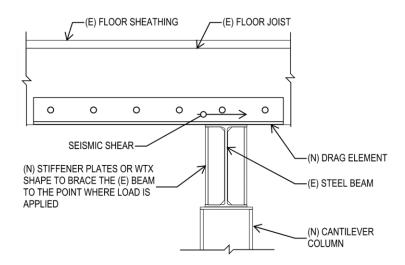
Detail illustrating how torsional forces on an existing beam can be addressed with the use of new stiffener plates.
